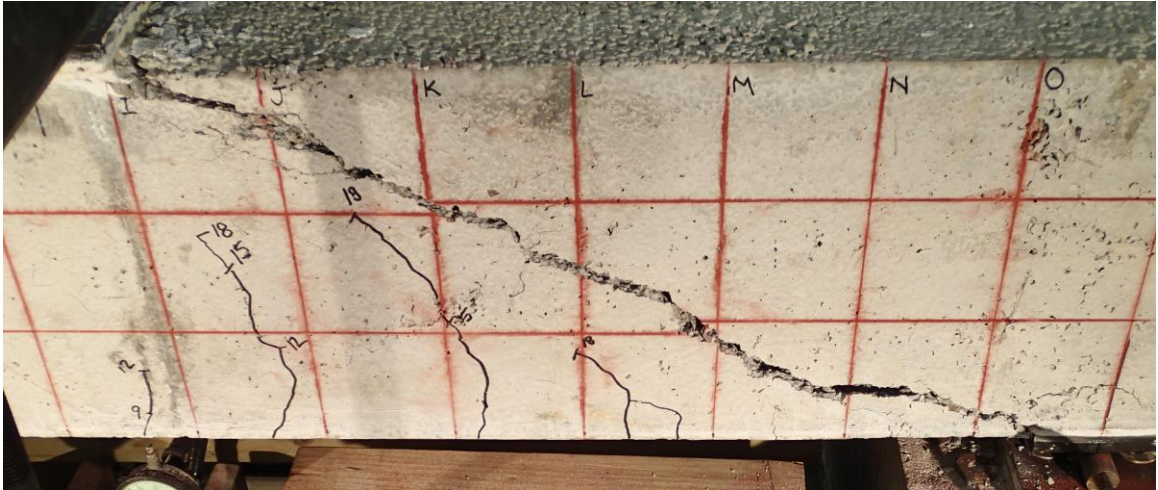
Specimen J-2: South Side Failure Inclined Crack
